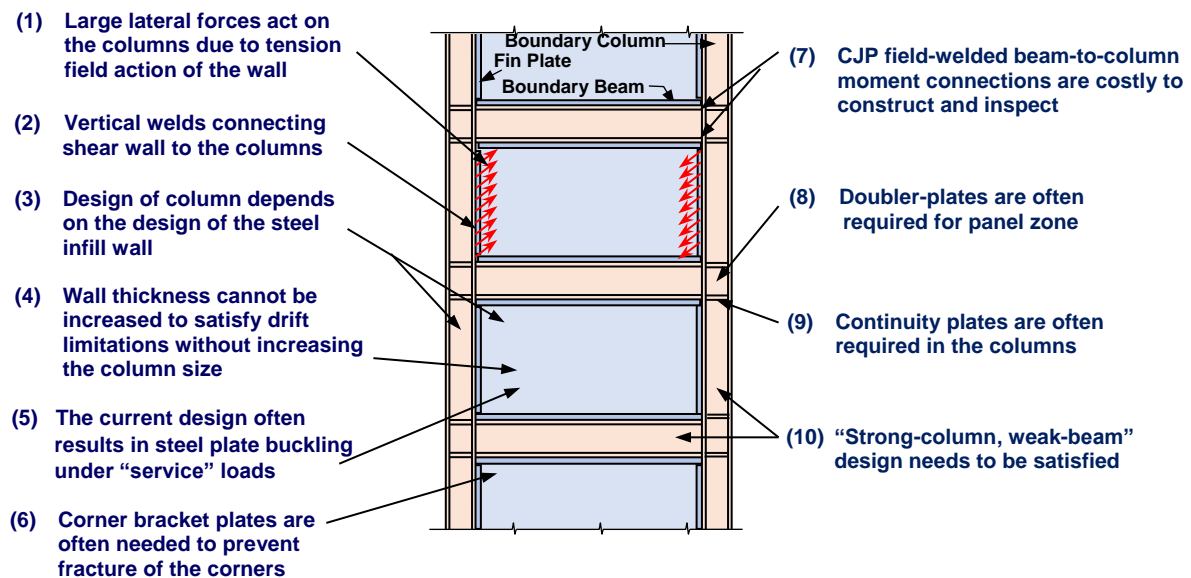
Disadvantages of the current unstiffened Steel Plate Shear Wall
